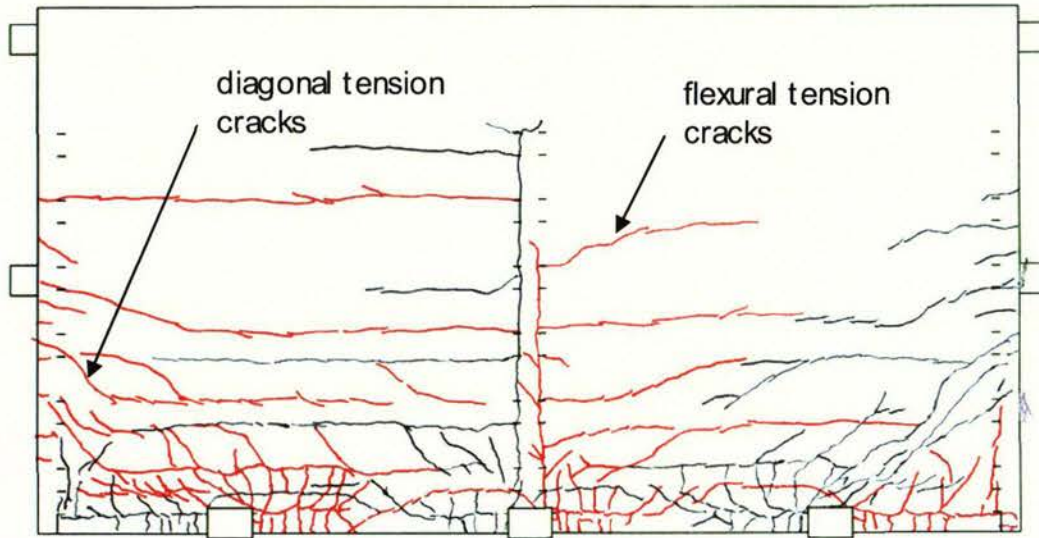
Crack pattern in floor slab at 3% drift displacement.
